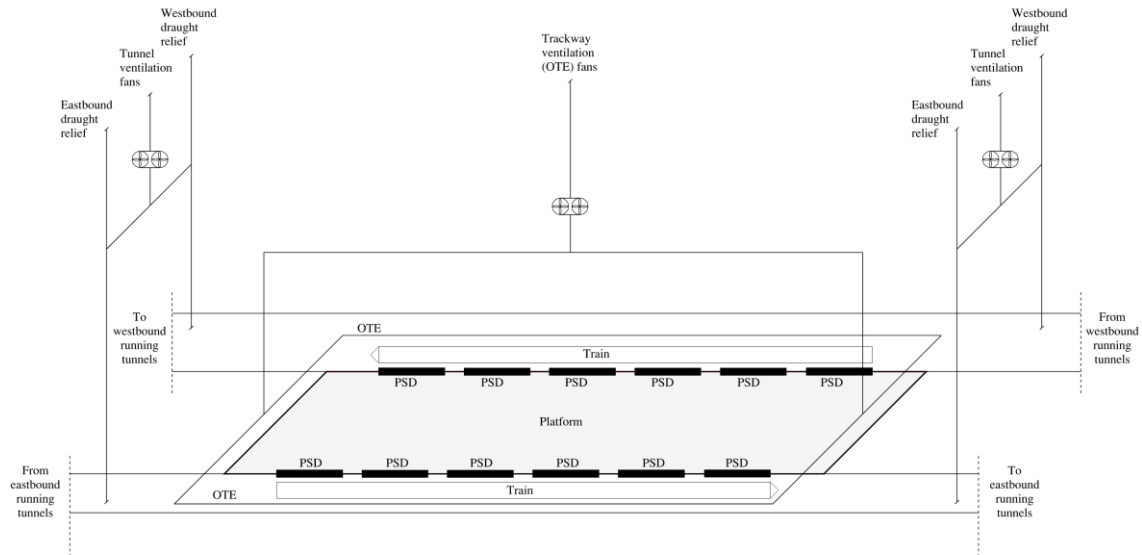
Simplified underground rail station typical tunnel ventilation system arrangement.
